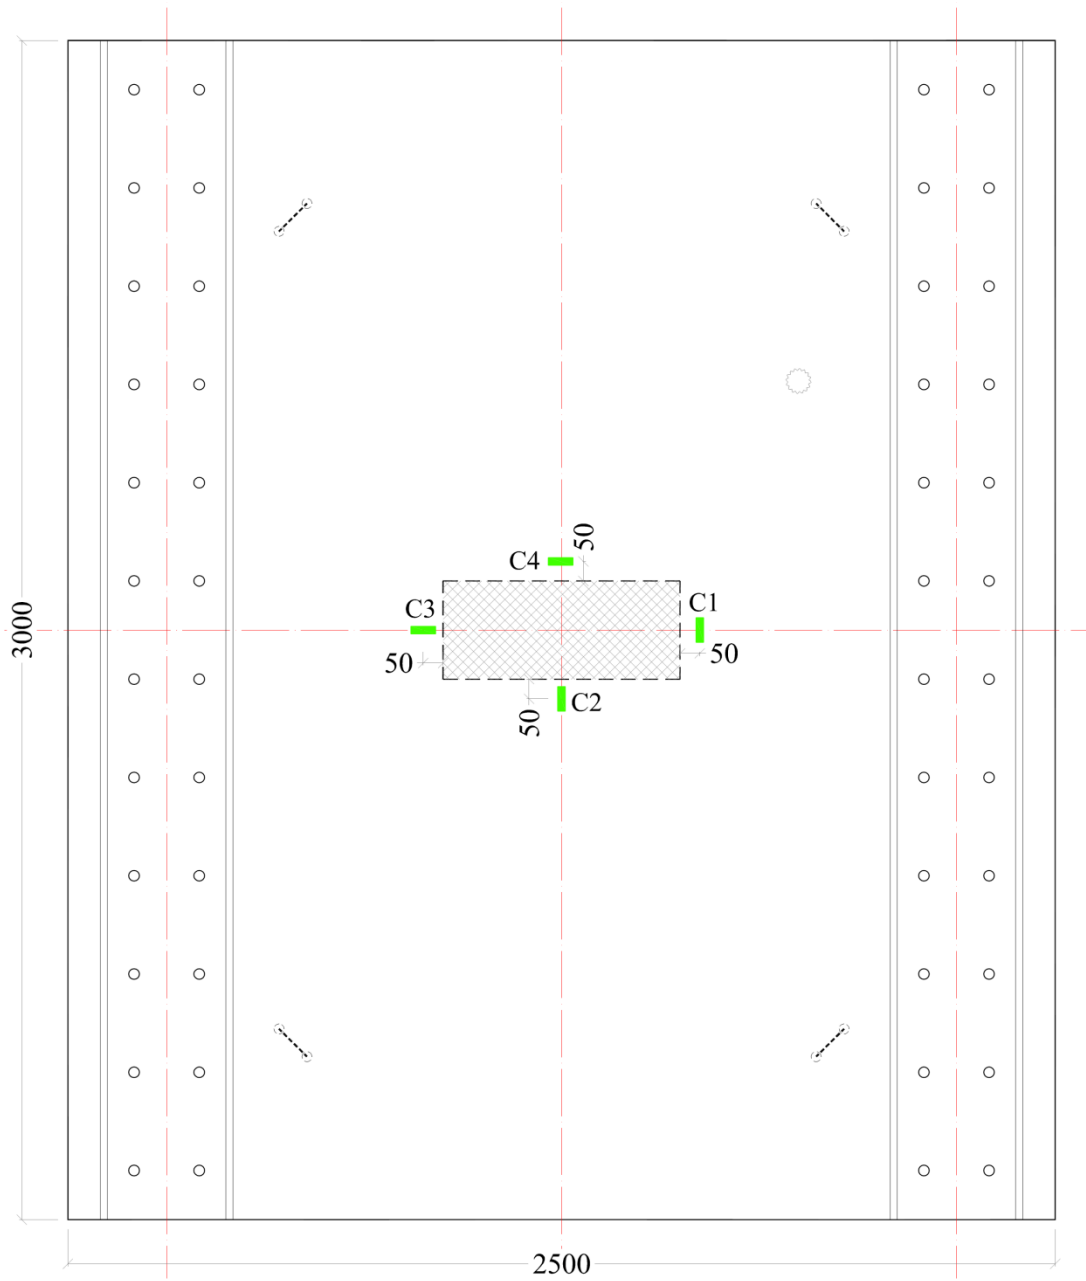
Typical location of strain gauges on the top surface of concrete deck slabs
